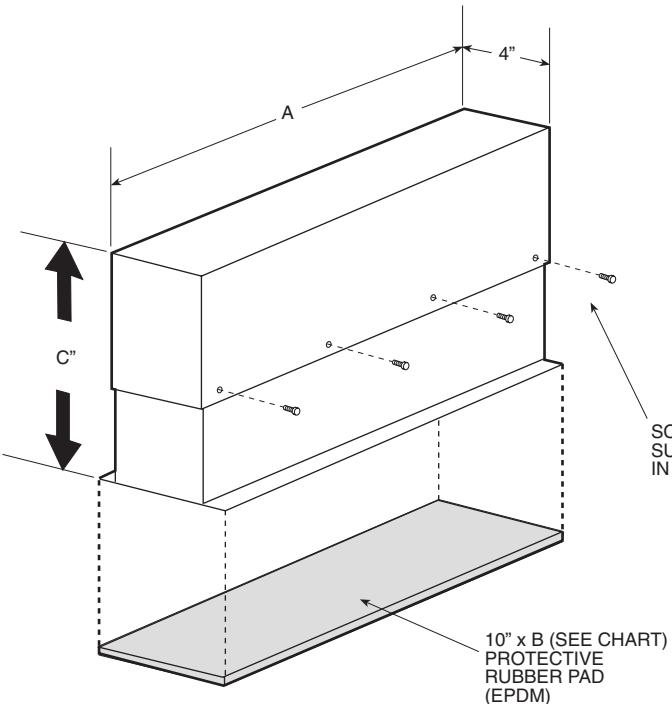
B — Roof Curb Details (48/50HJ008-014 Section Only)
